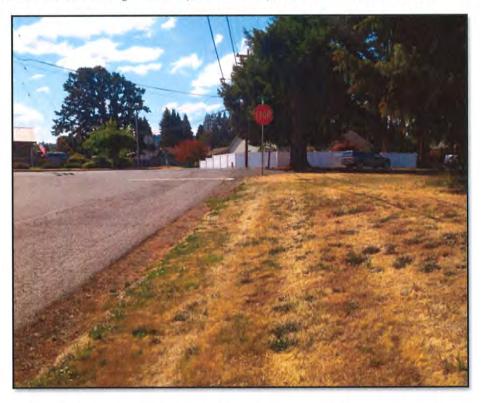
Sight Distance Looking West from Proposed Access Intersection
